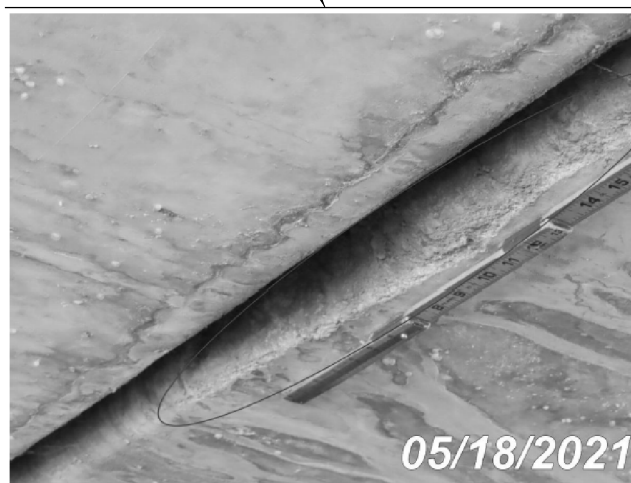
S02 (Unit 0: PS Conc Slab (Sonovoid))
